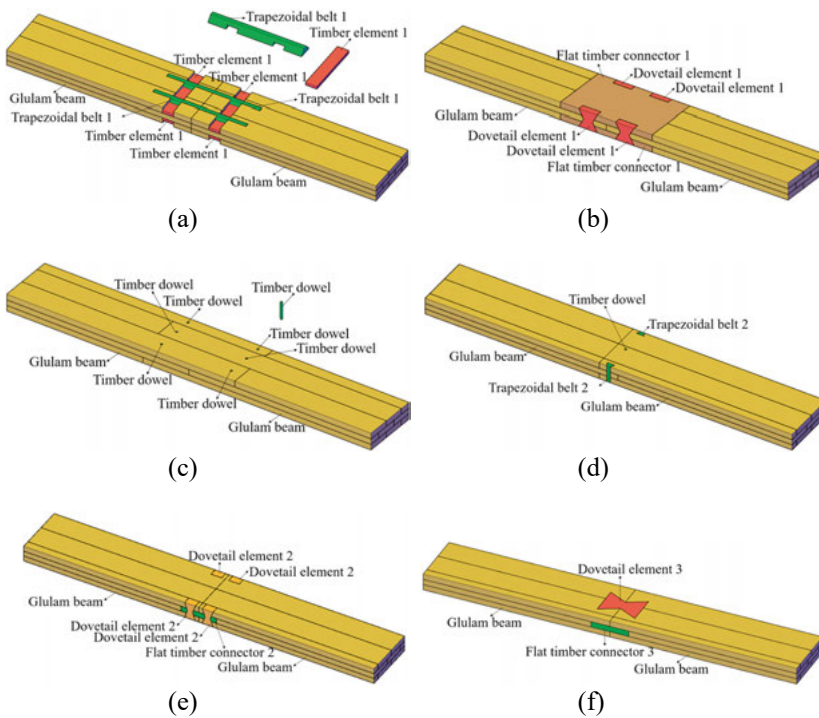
Examined specimens, (a) specimen 1, (2) specimen 2, (3) specimen 3, (4) specimen 4, (5) specimen 5, and (6) specimen 6.
